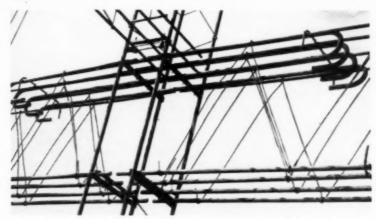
Supports on the Column Bars for Beam Reinforcement.
